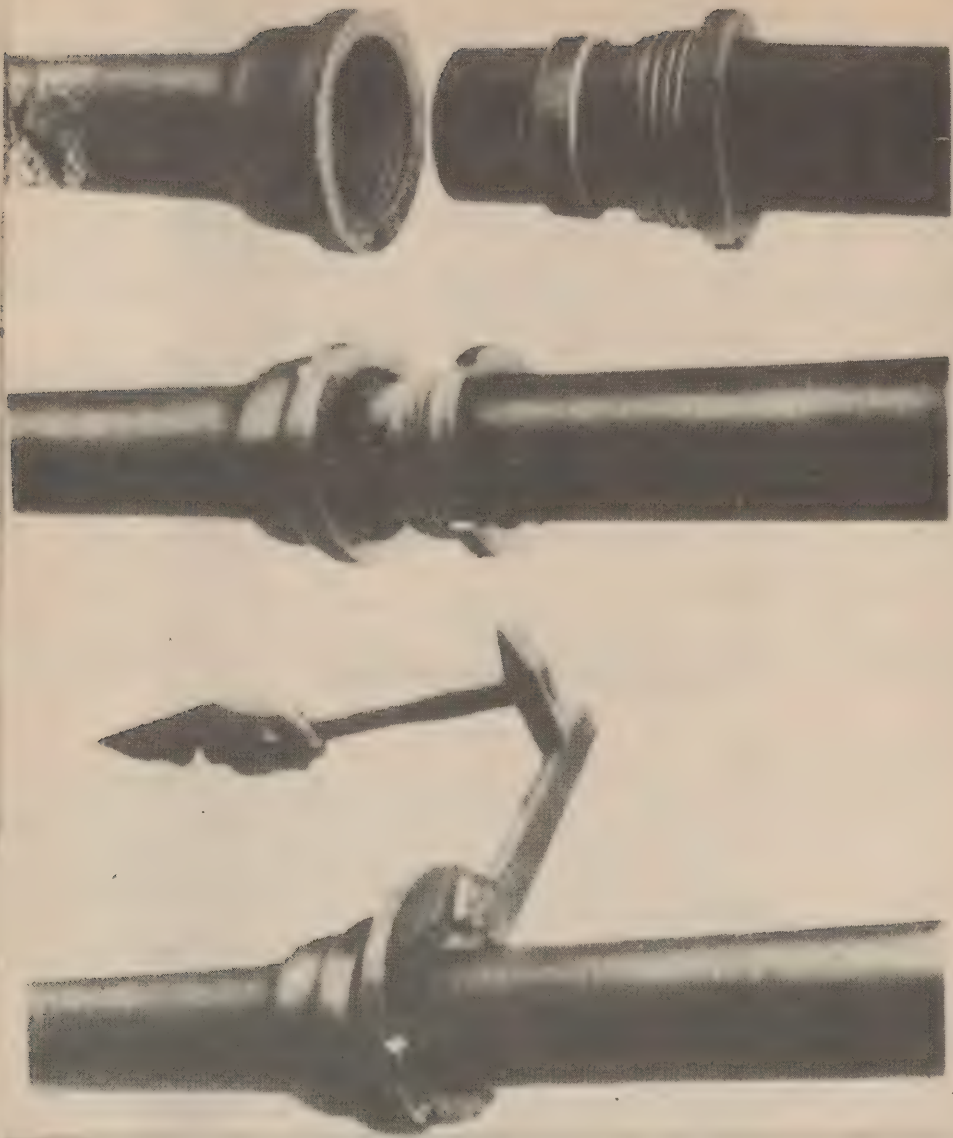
t, special joint for cast iron pipe using threaded nipple, rubber gasket and special wrench.
